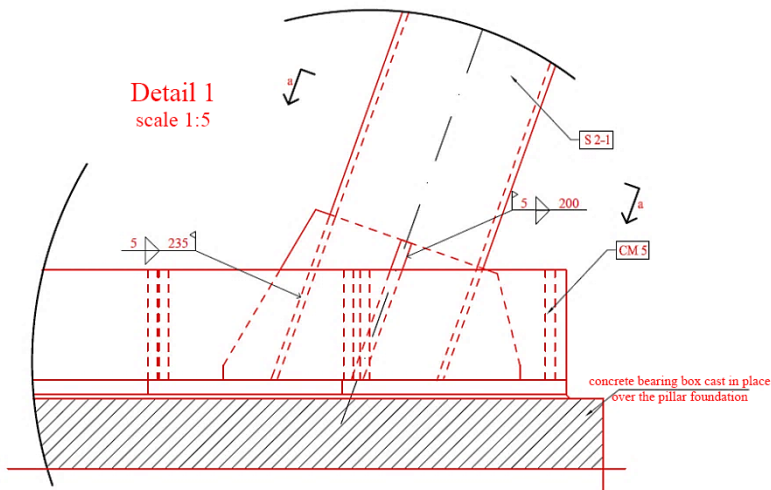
Detail of bottom joint between metallic bar sustaining the trestle and foundation - project
